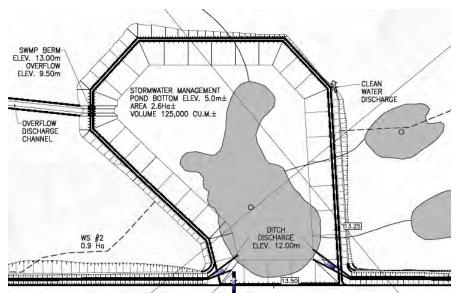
Steensby Port Ore Stockpile Stormwater Management Pond
